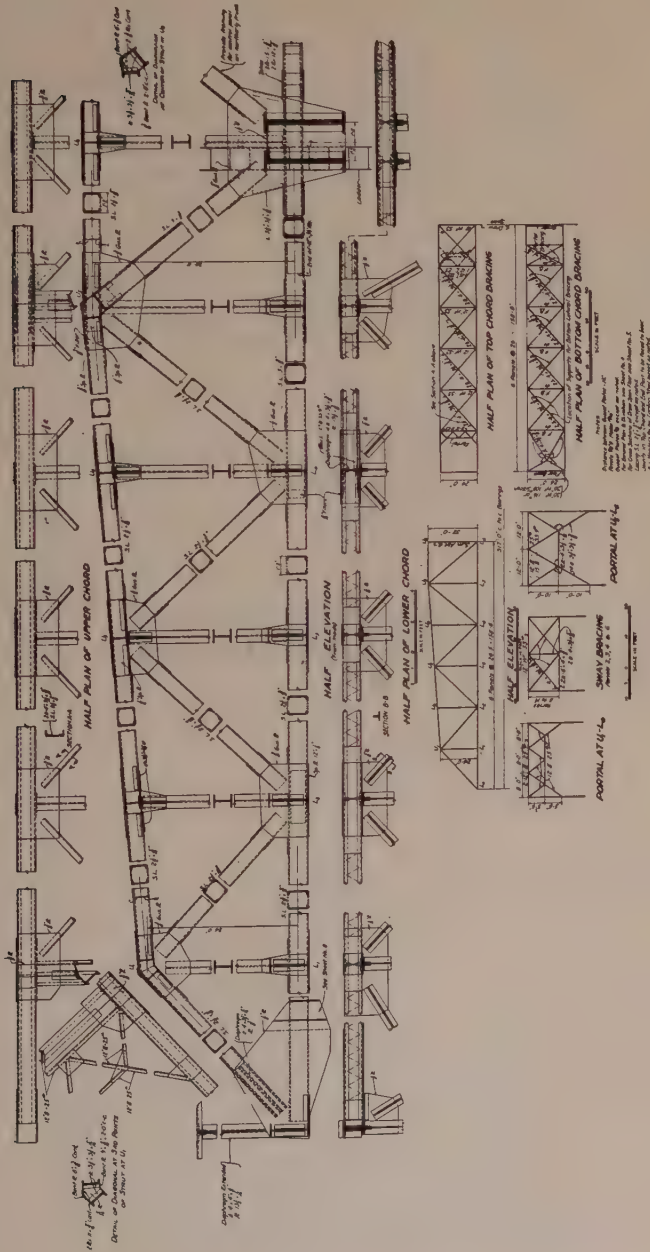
DRAW SPAN TRUSSES AND BRACING
